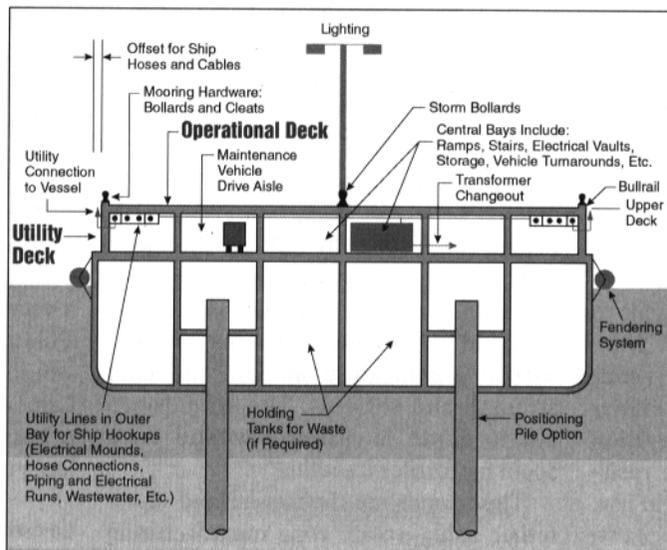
Concept for hybrid floating pier held in place by positioning piles.
